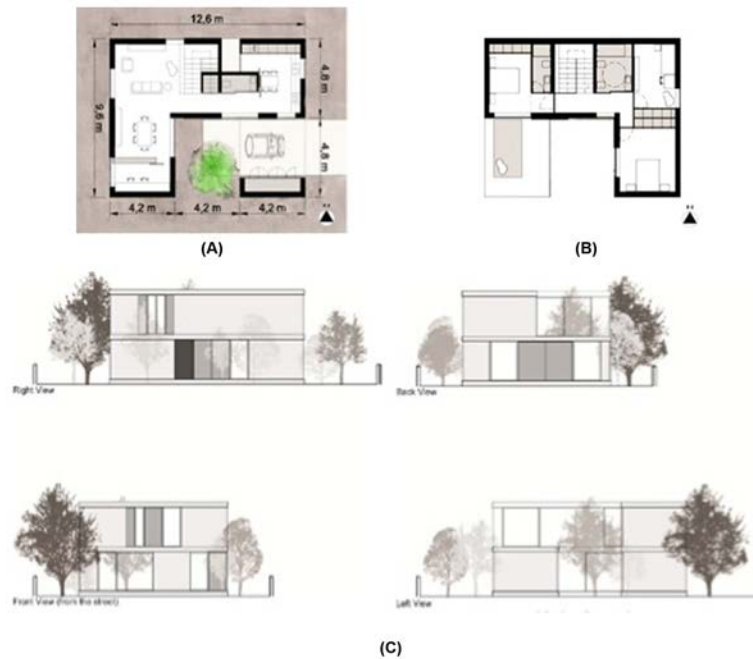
Single family-house used as case study. Plan view of the ground floor (a) and first floor and the four lateral views.
